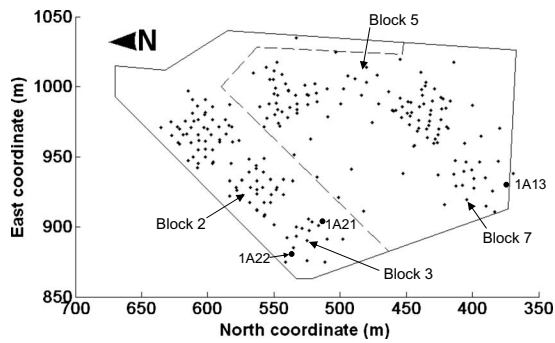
Plan of the driven pile construction site and borehole locations over the site
